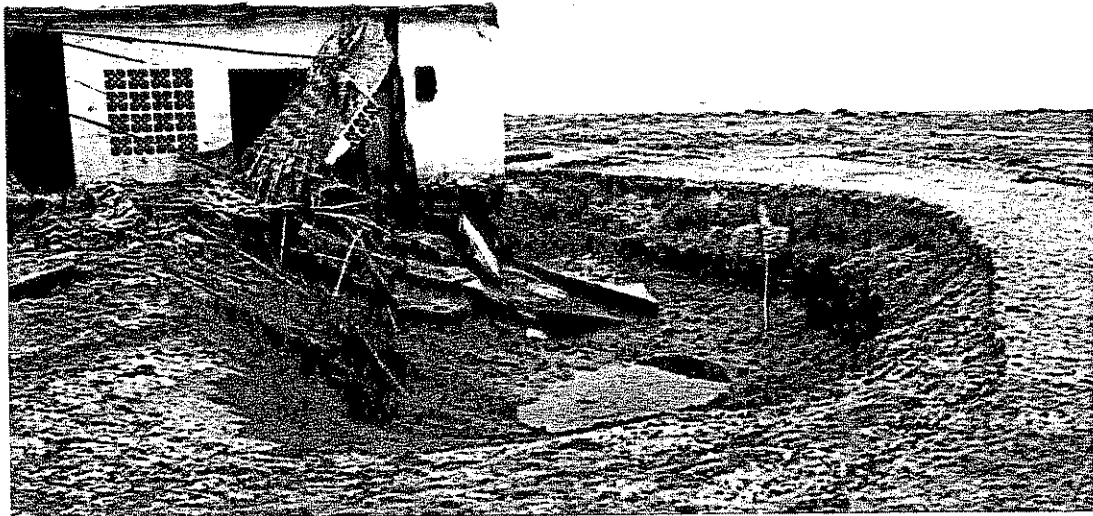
Scour around the southwest corner of a La Punta house, 30 m from the coast. Scour was observed at the corners of almost every structure in the inundation zone.
